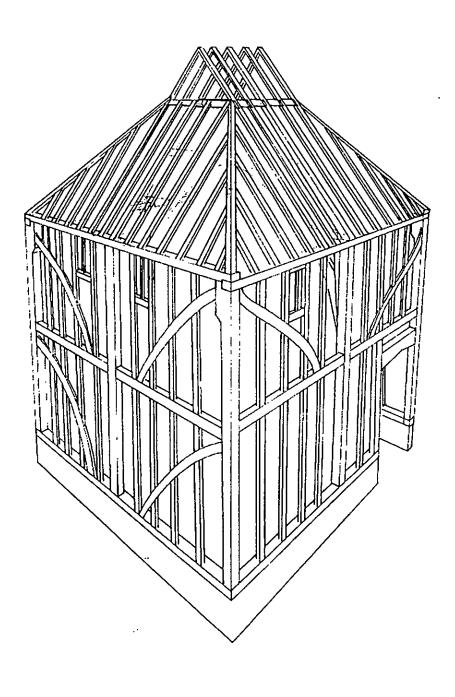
Reconstruction drawing showing kitchen as built, c.AD1400. This drawing based on an earlier reconstruction drawing by Cecil Hewitt (see figure 10).
